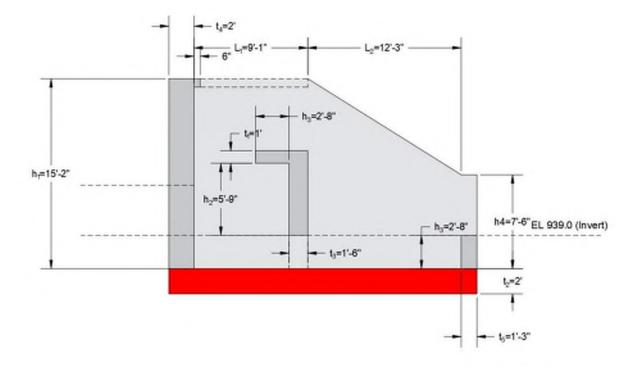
Impact Basin Cross Section and Base Slab (In Red)
